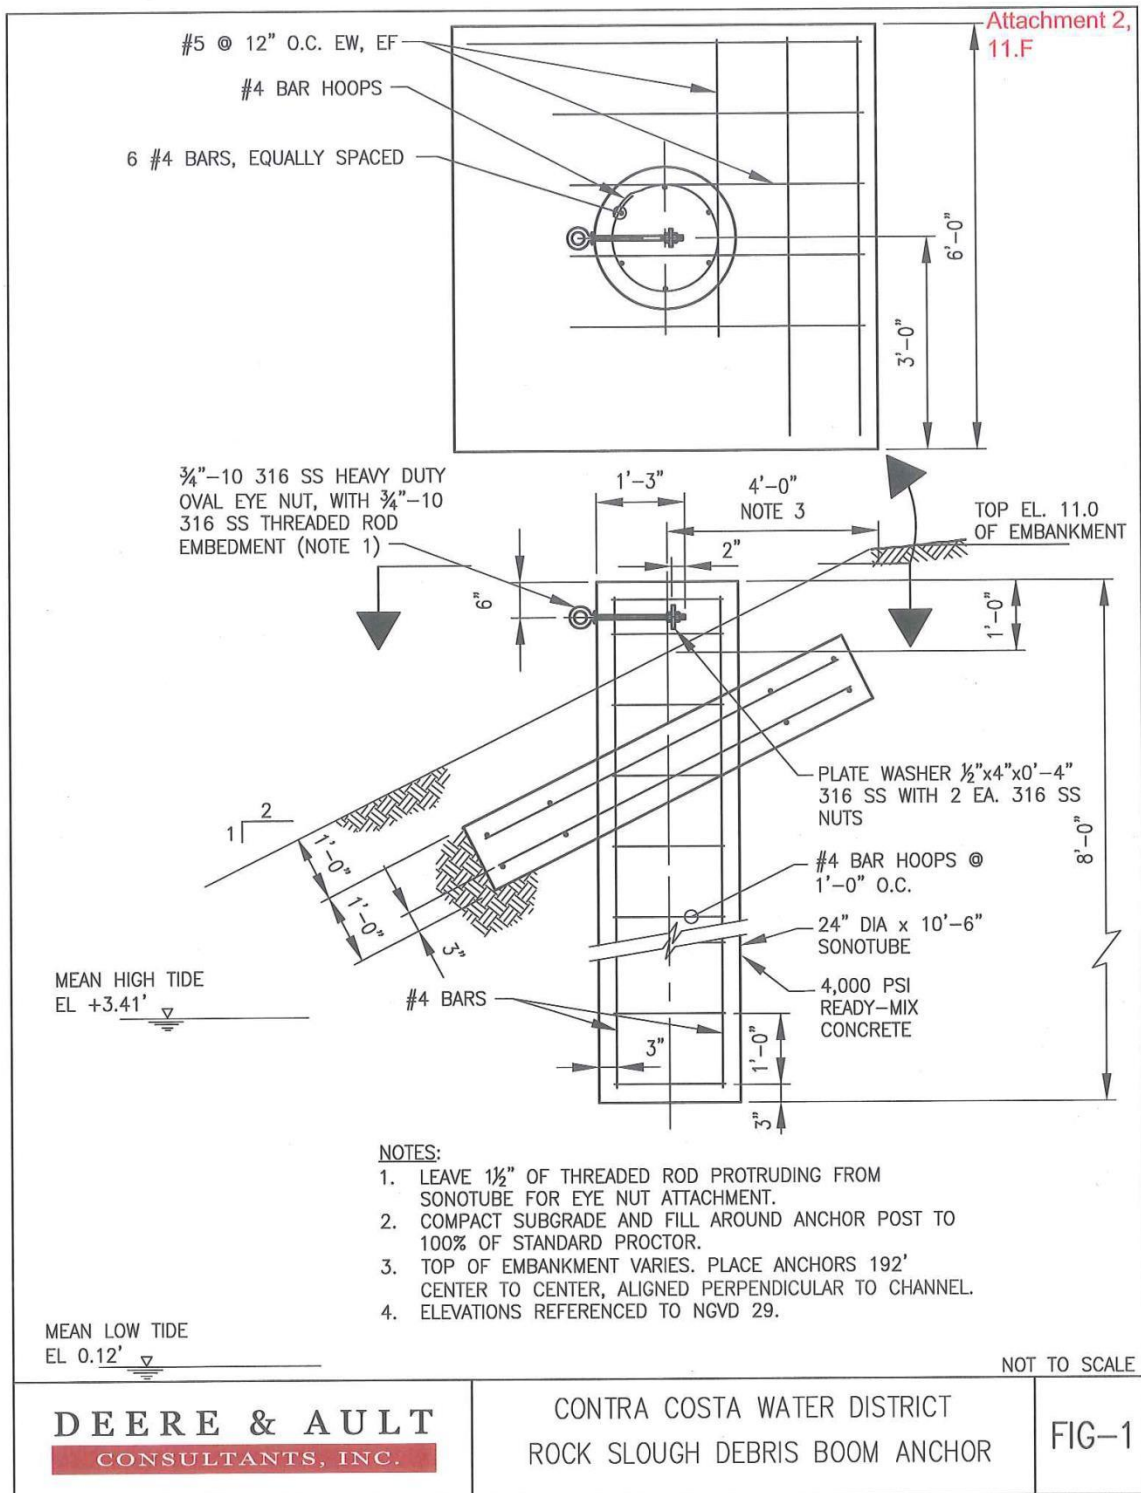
Engineering Detail for Proposed Piling Anchors for Relocated Log Boom
